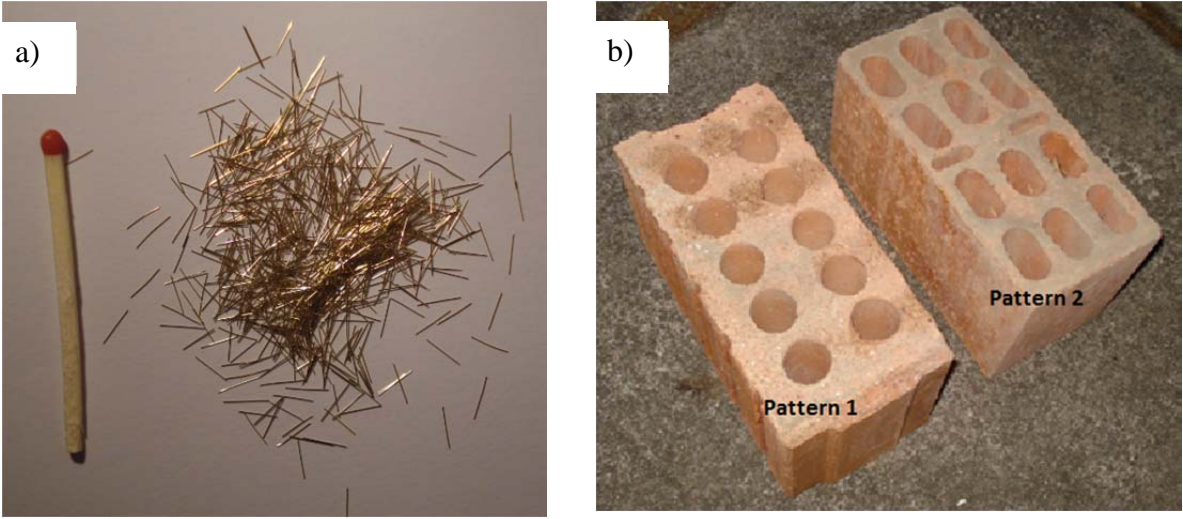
Picture of Steel Fibres (a) and Masonry Units (b)
